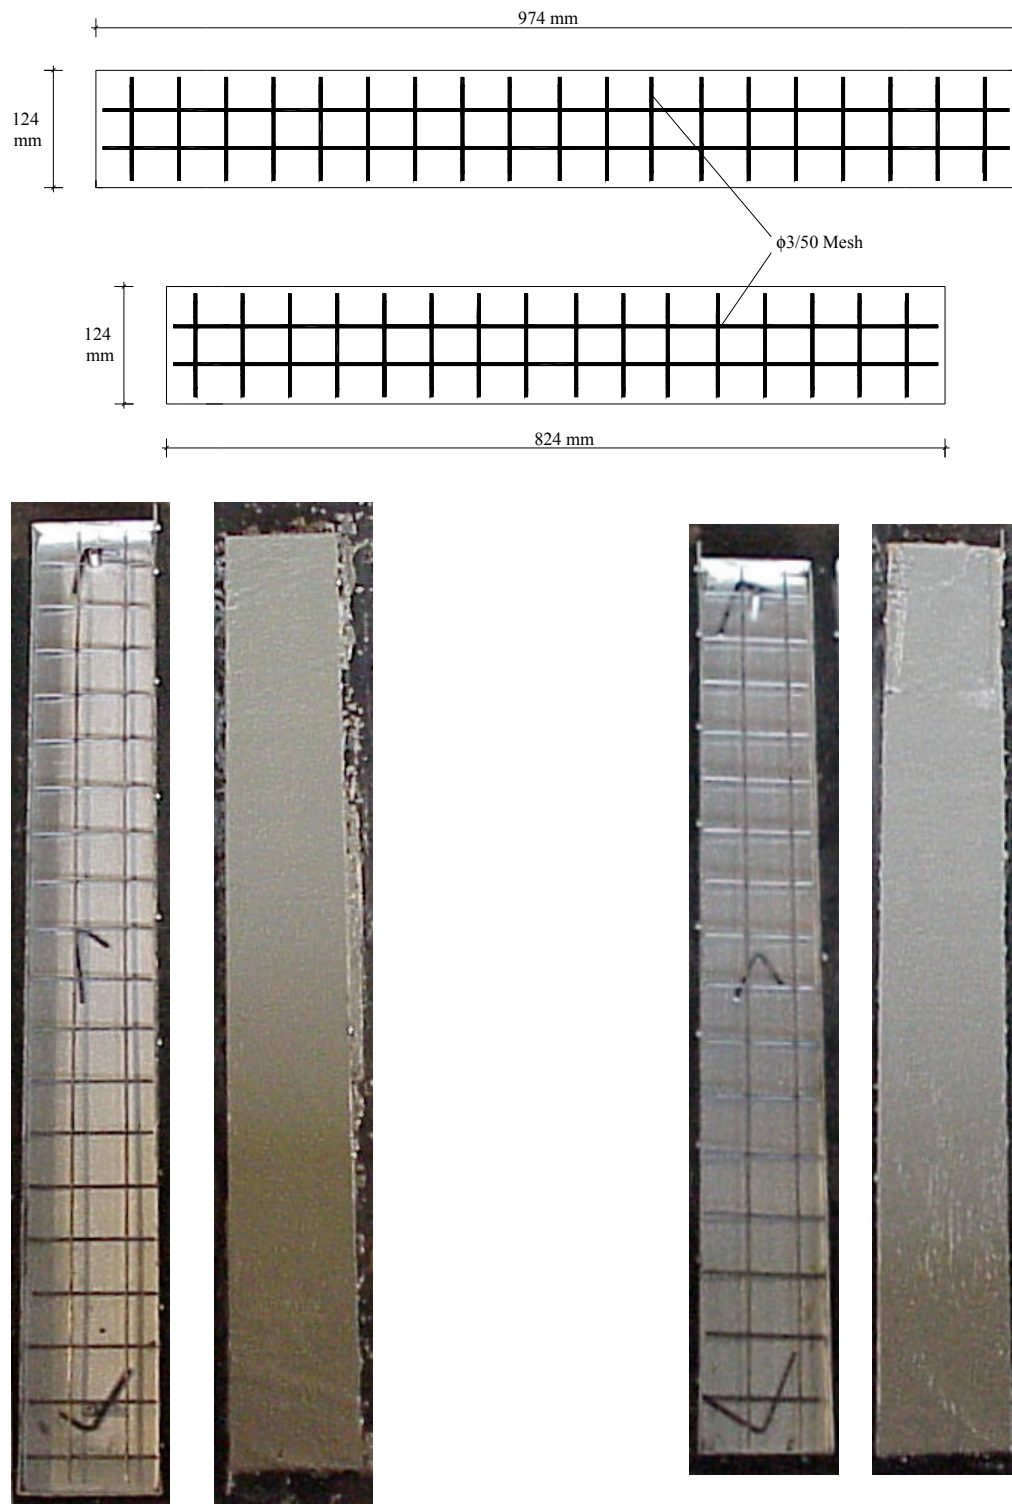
Dimension, reinforcement and moulding of Type F panels
